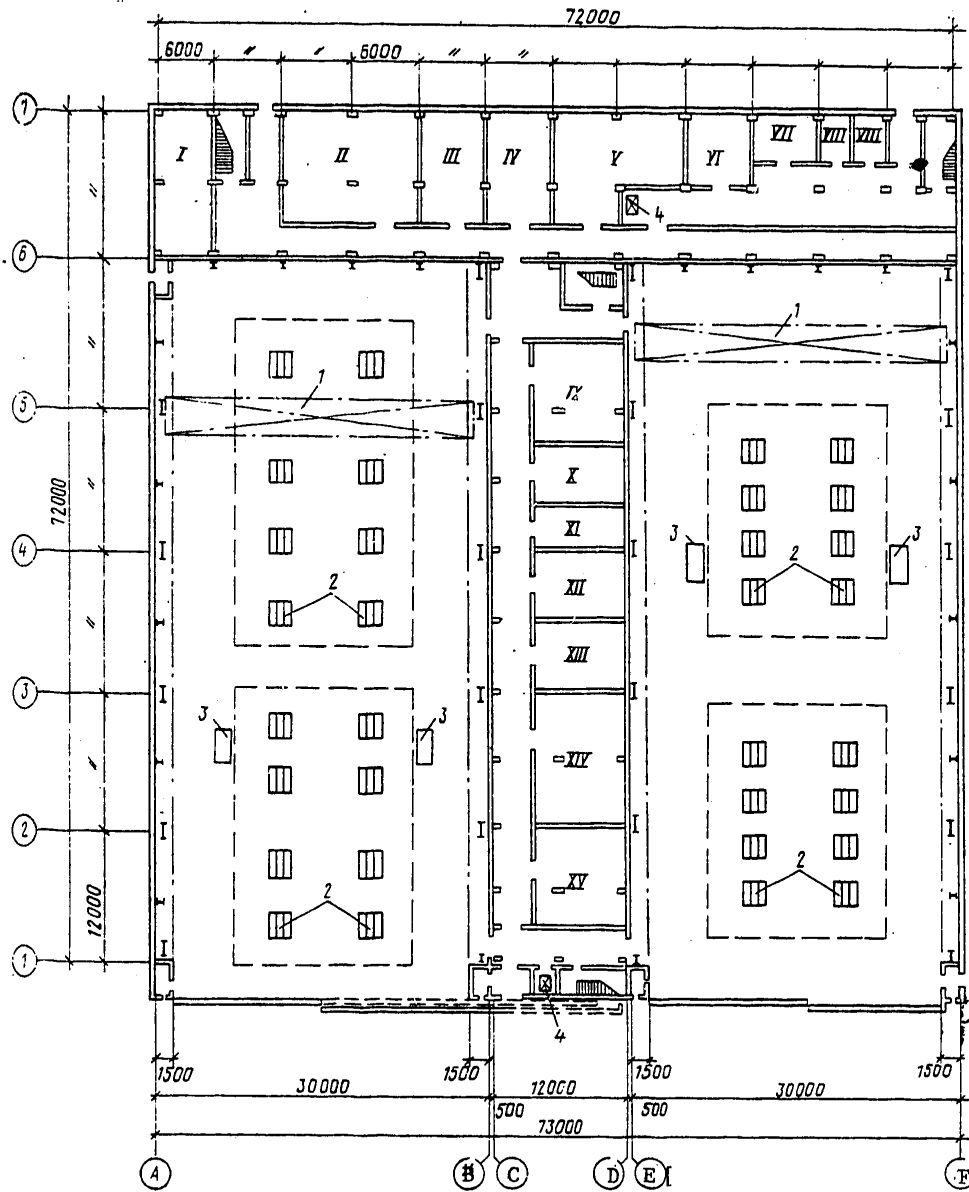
Layout of the section painting and drying section at class I and II shipyards
